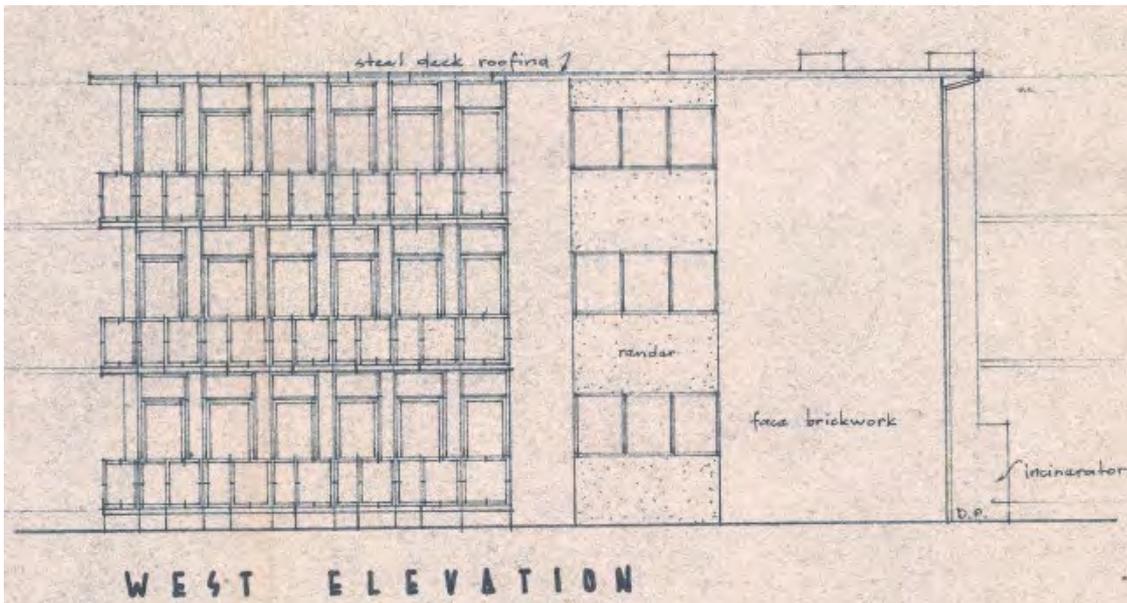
1960 drawings, front or west elevation (Source: Building File)
